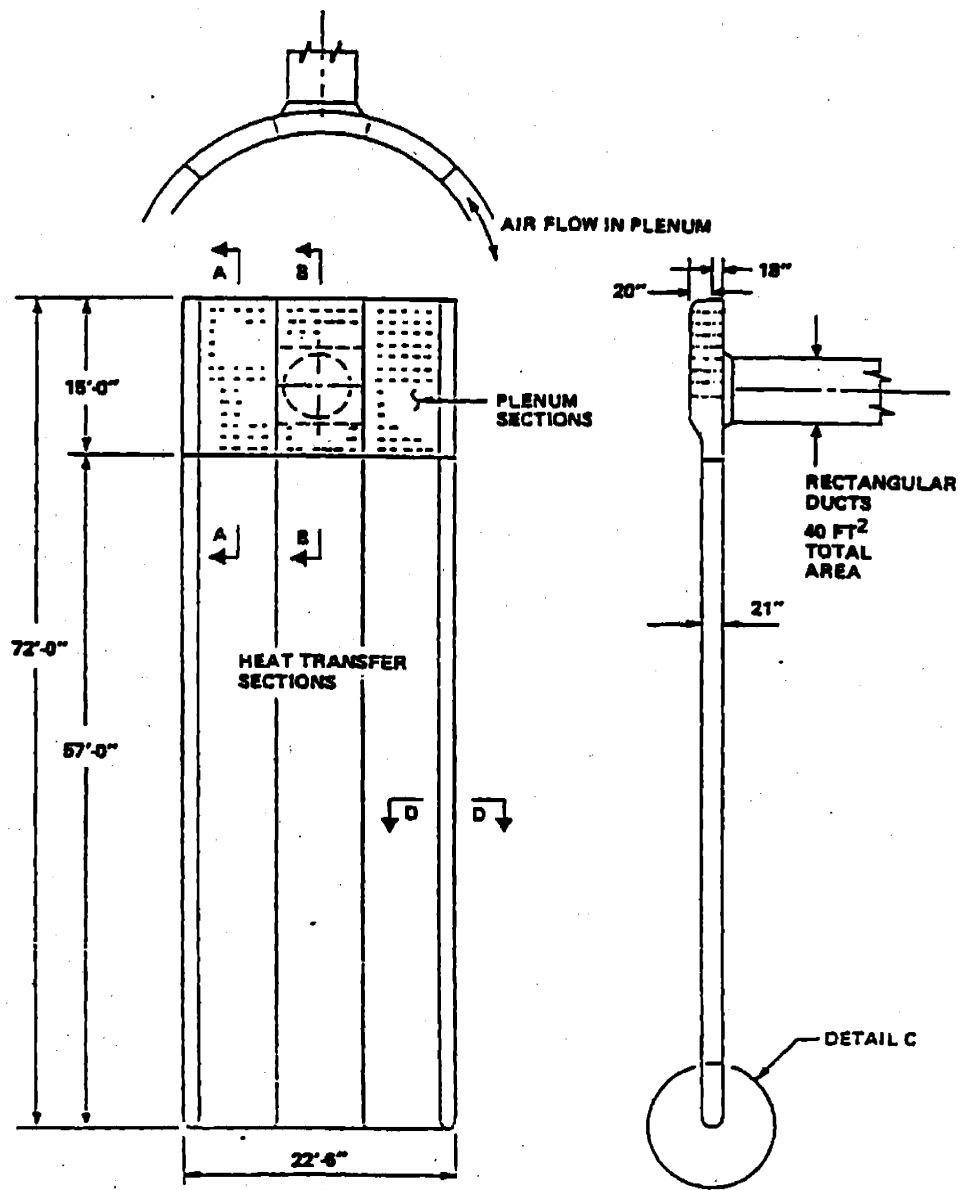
Air Cooling Panel Conceptual Design - Plan and Sections
